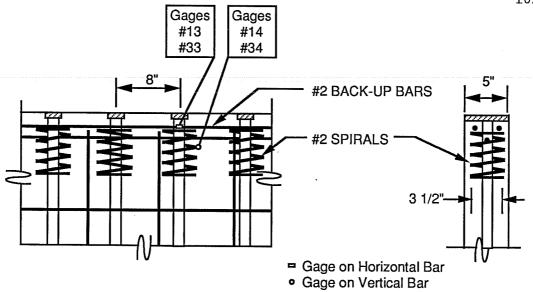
Slab #3 Spiral Detail @ Anchors I & J
